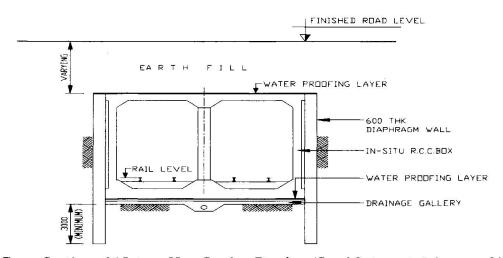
Cross Section of Metro: Non-Station Portion (Semi-Integrated Approach)
